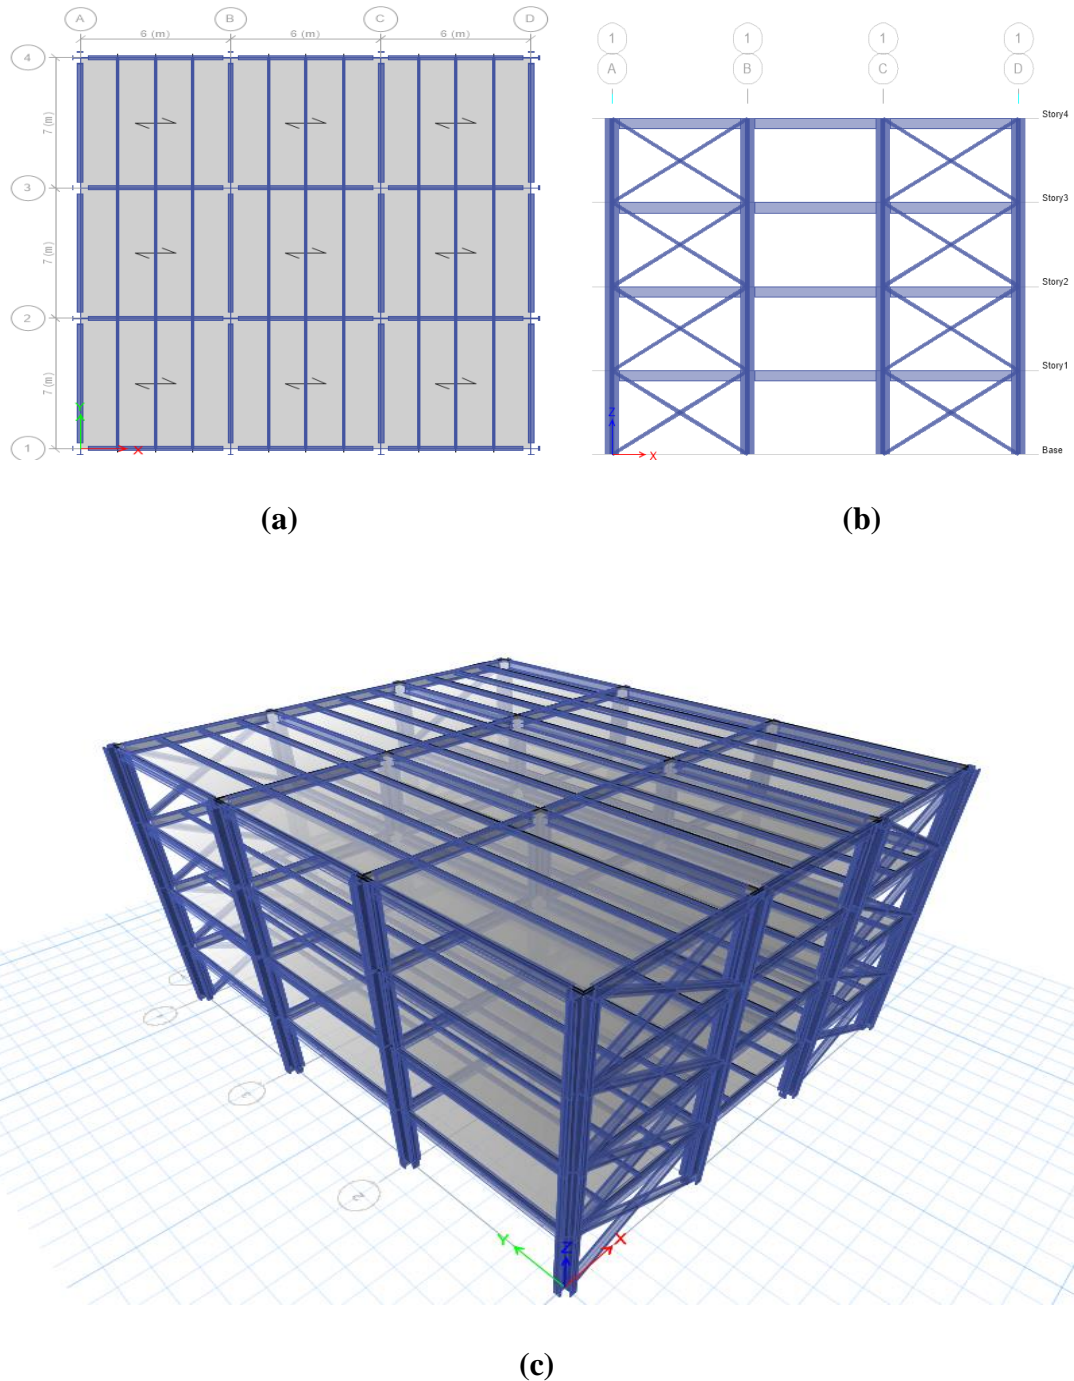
(a) Structure Plan (SCBFs), (b) Structure Elevation (SCBFs) and (c) 3D Rendered Model (SCBFs)
